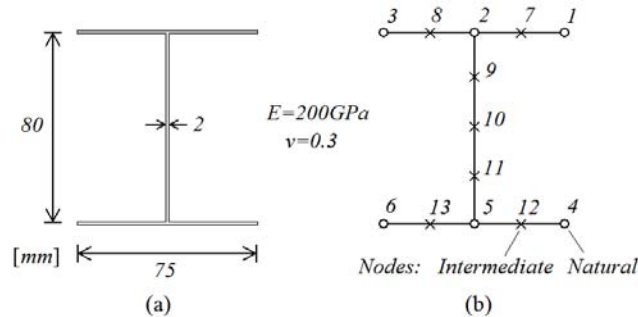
Cantilever I-section (a) geometry and dimensions and elastic constants, and (b) GBT nodal discretization
